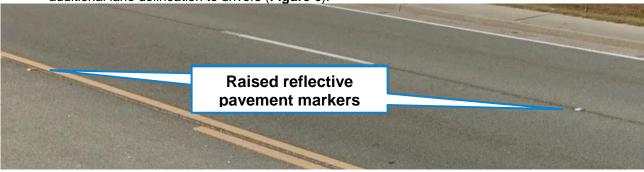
View of Raised Reflective Pavement Markers along SR 196
